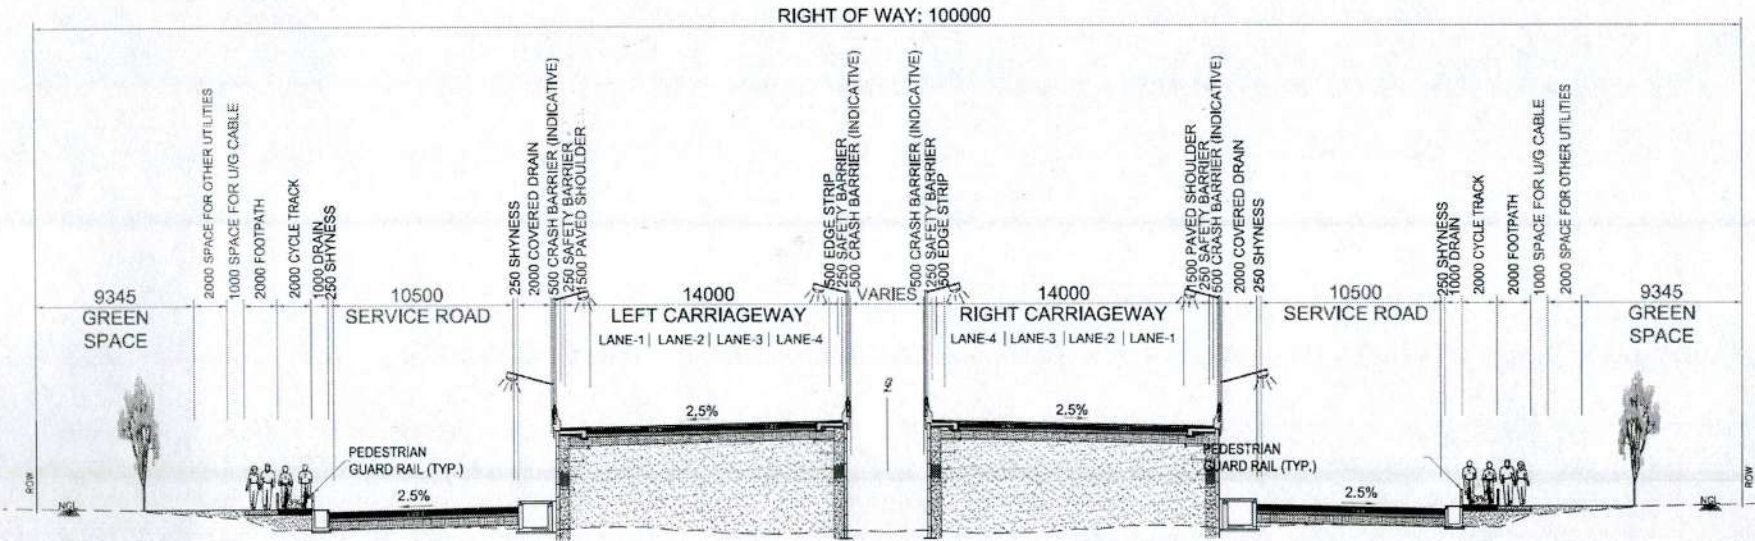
Typical Cross Section – At Tumkur Road Flyover Approach Location
